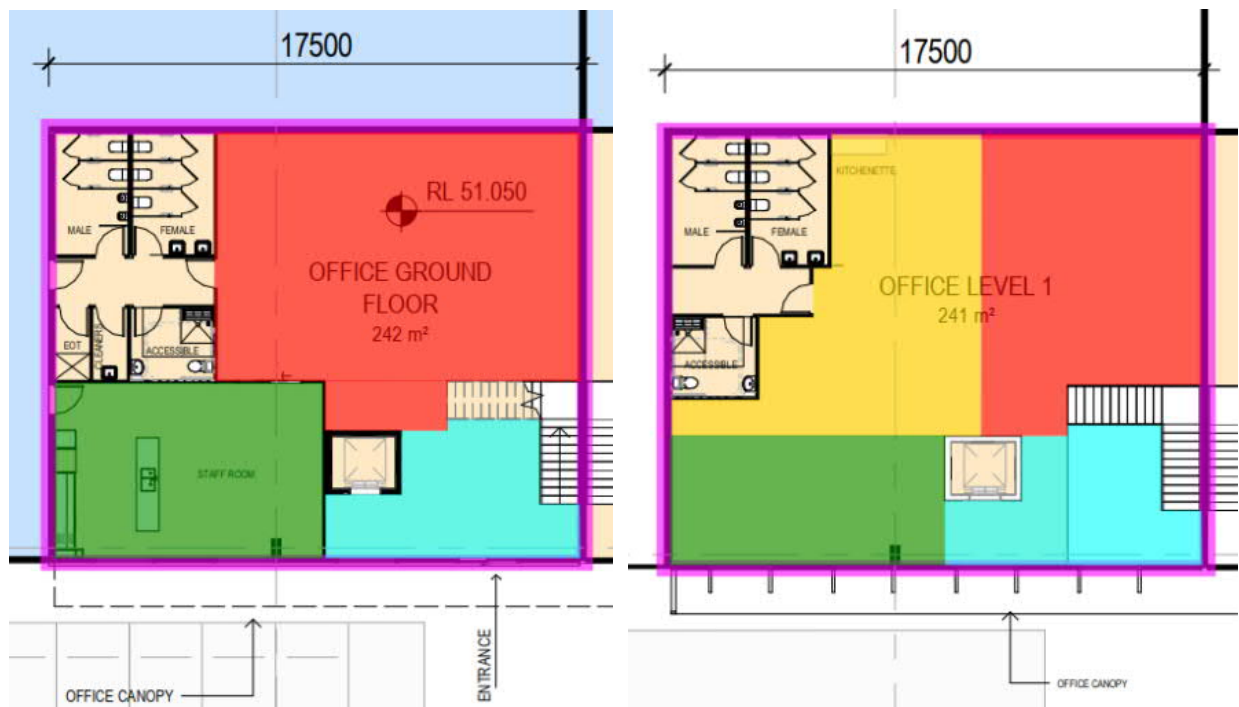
HVAC zones and thermal envelope for 6 McLaren Drive Ground Floor (Left) and First Floor (Right)
